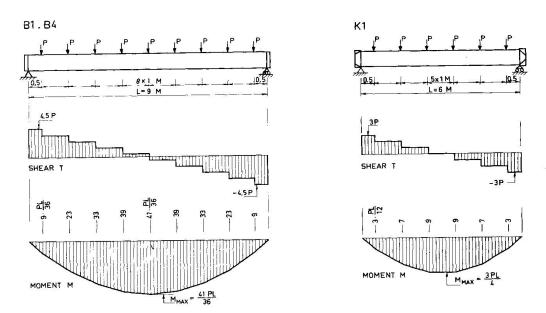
Distribution of load, shearing forces and bending moment for the test girders.
